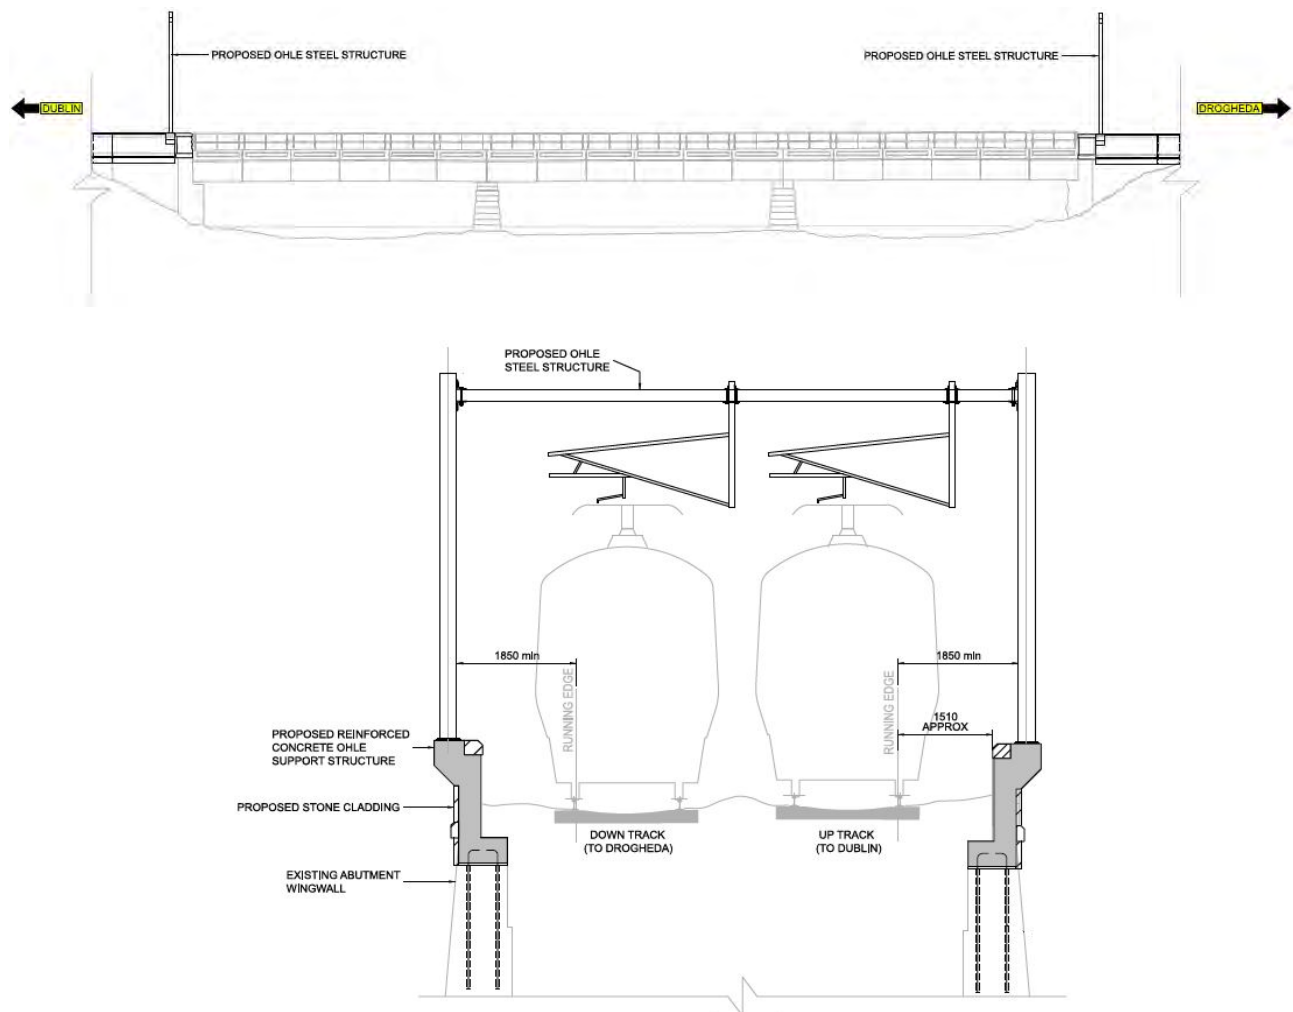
Elevation and typical section of Rogerstown Viaduct showing proposed OHLE masts
